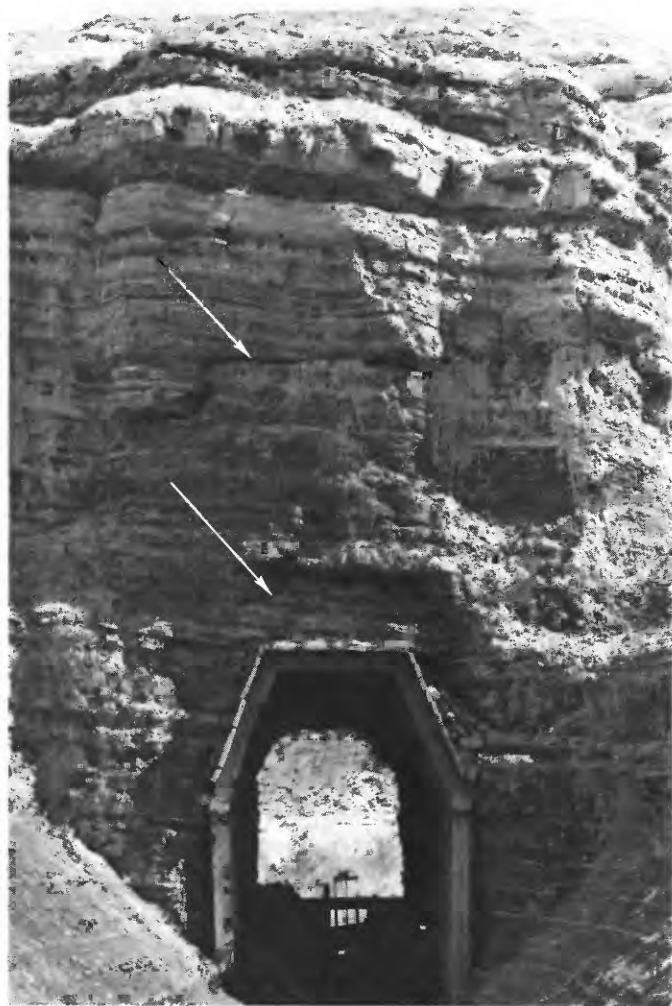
South portal of abandoned narrow-gage railroad tunnel in cliff of Summerville Formation along Price River, about 3.25 miles (5.2 km) northwest of Silvagni Ranch. Inward movement of walls and timber sills, resulting from digging of irrigation ditch, allowed arch-shaped tension fractures (arrows) to form in rocks as much as 10 ft (3 m) above tunnel roof. Headgate for irrigation ditch is in distance, near north portal.
